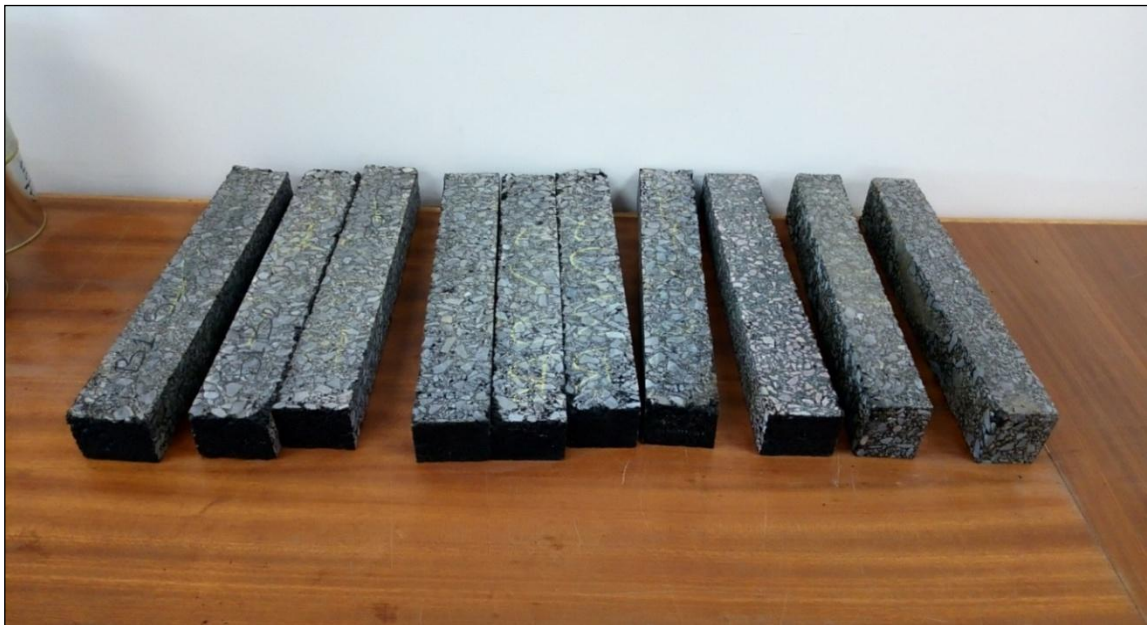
Cut and Sawed Asphalt Mix Beams Aim to Perform Four-Point Beam Bending Test (Source: Author, 2019).
